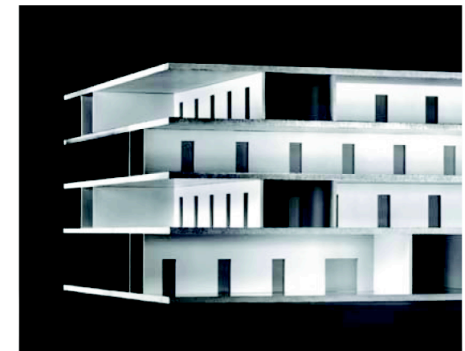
Model of loadbearing structure with shear walls offset or rotated through 90°
